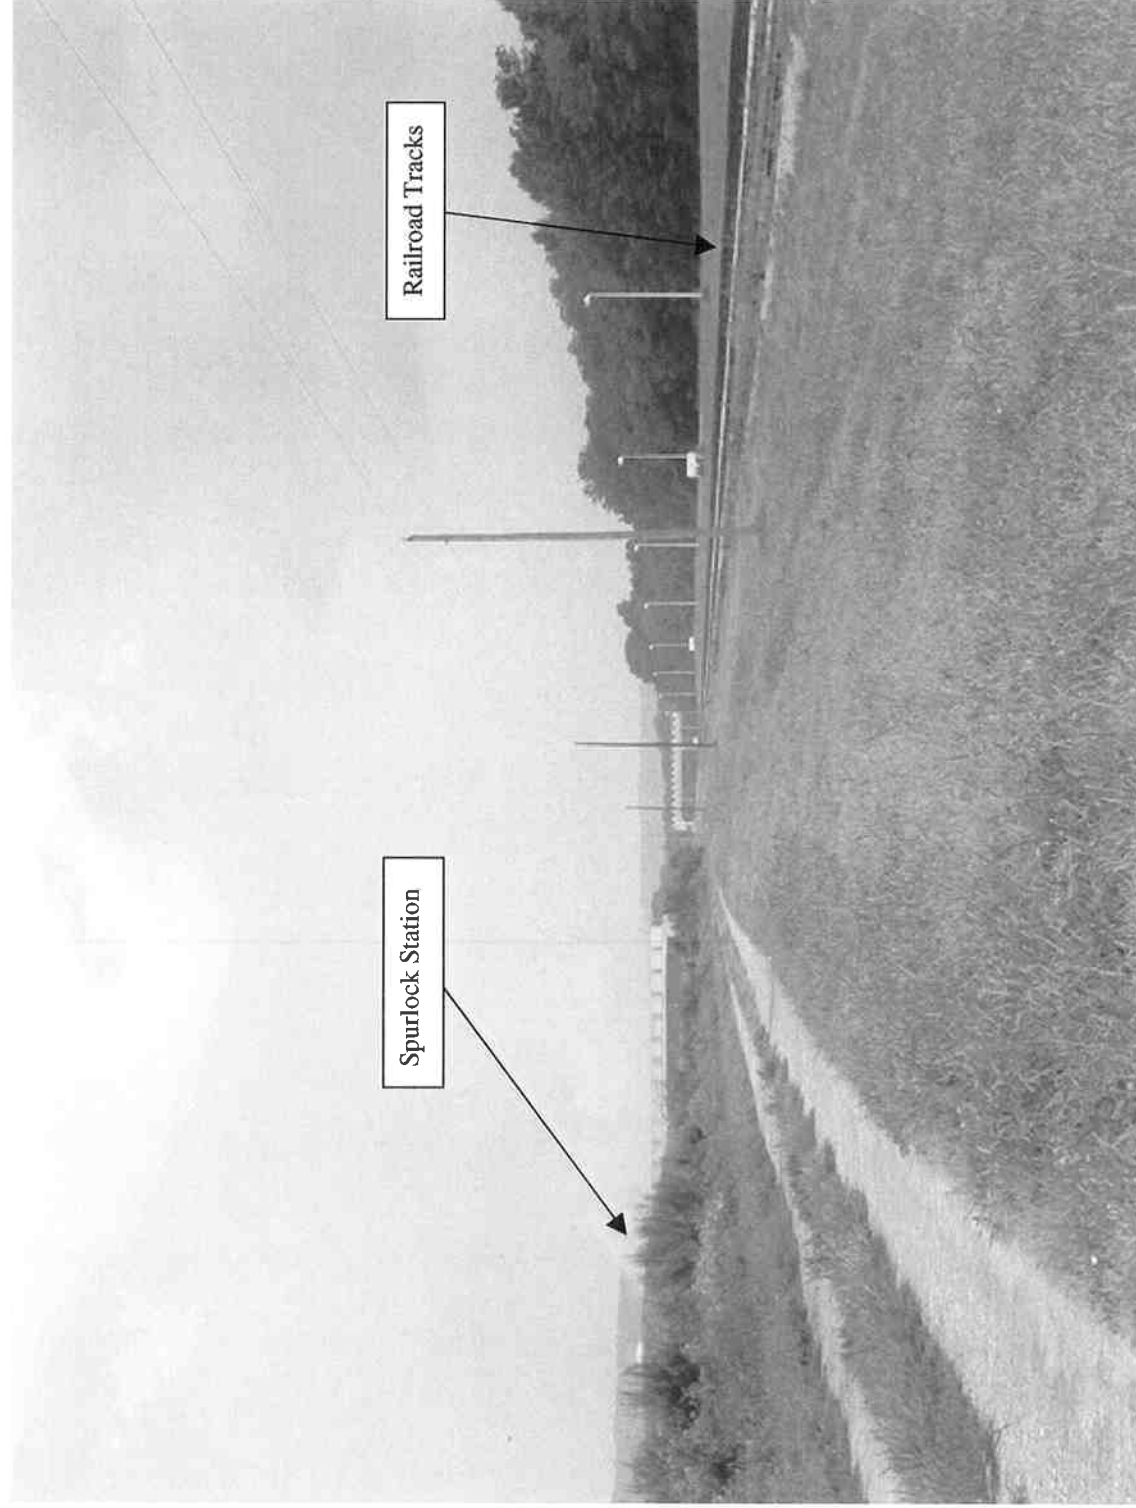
Looking West Down Proposed Right-of-Way at Spurlock Station: Proposed 345-kV Transmission Line would Exit the Station and Parallel the Railroad Tracks.
